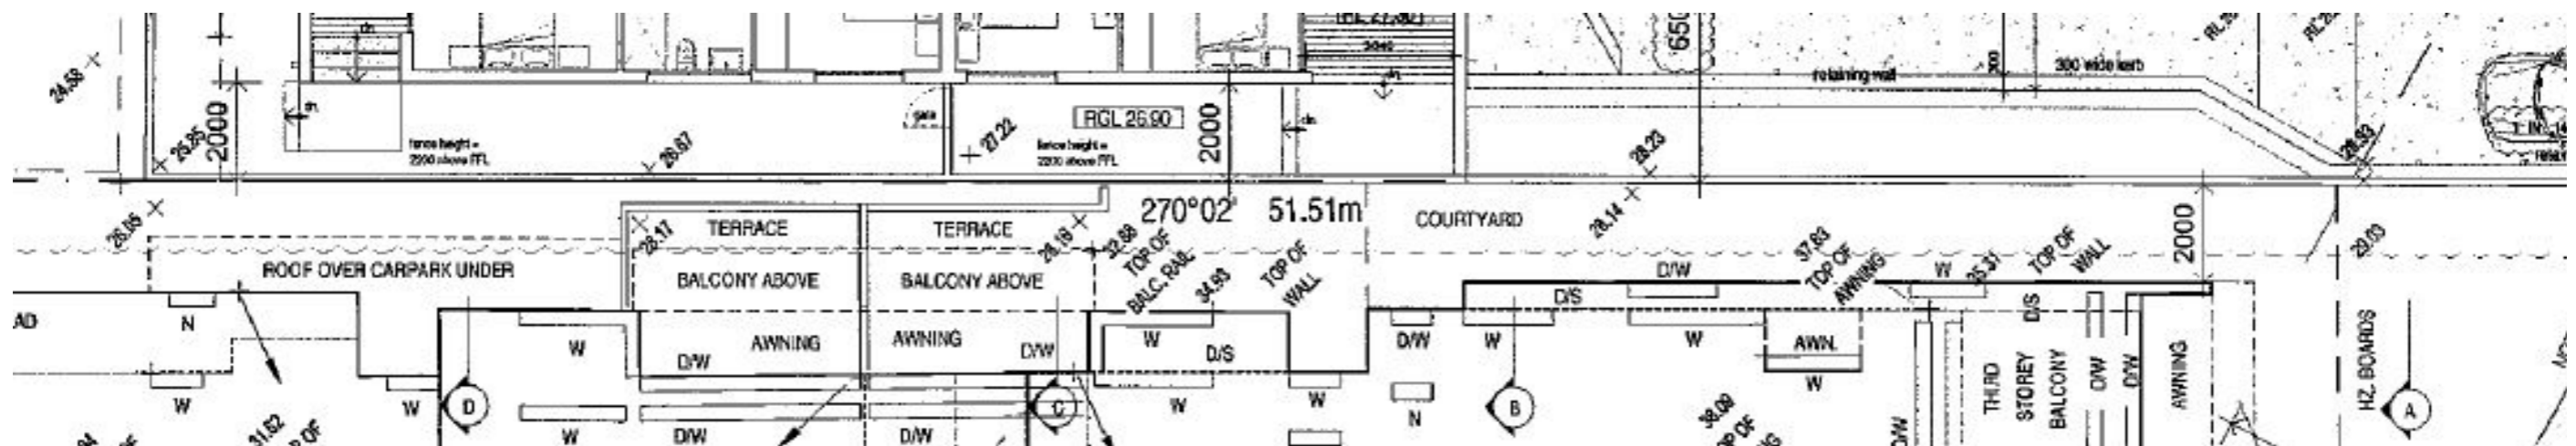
Detail of the ground floor plan showing the southern setback of the building
